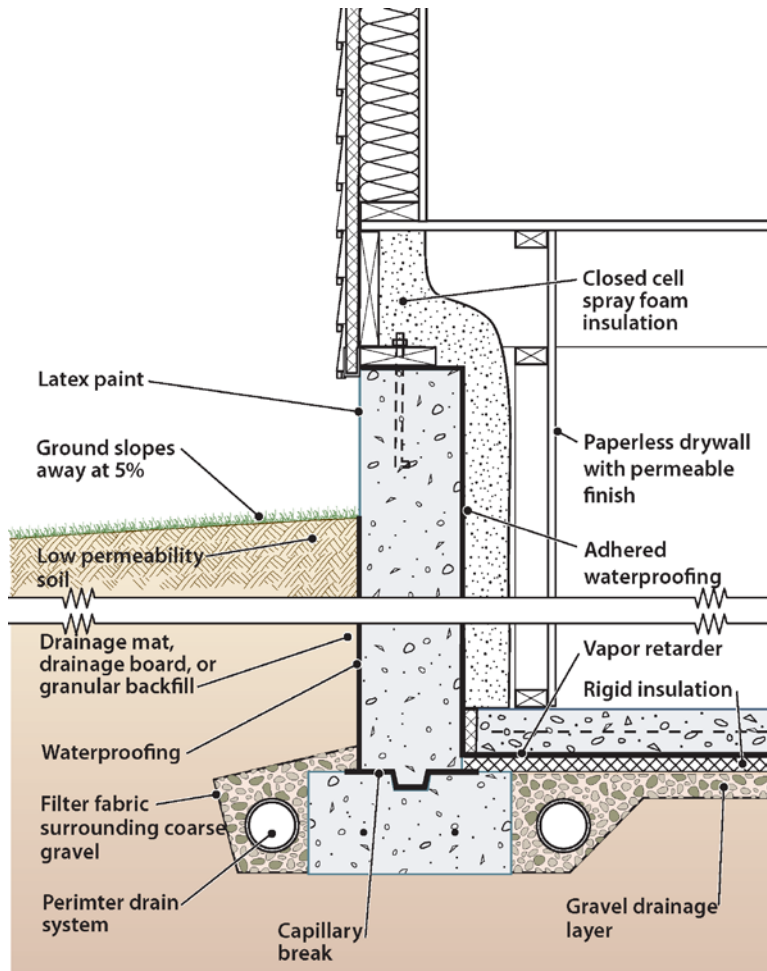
Cast-in-place concrete foundation wall interior closed cell spray foam insulation
